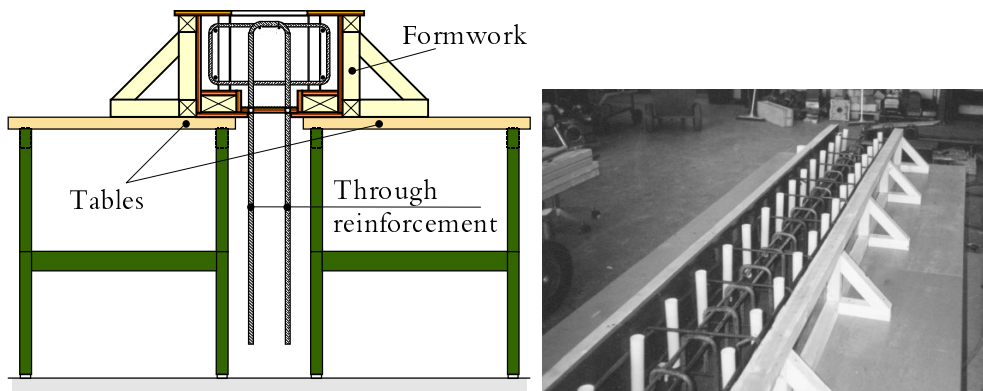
Cross section of the casting situation and photo of the formwork for one of the footings. The footings were placed on two long and parallel tables.
